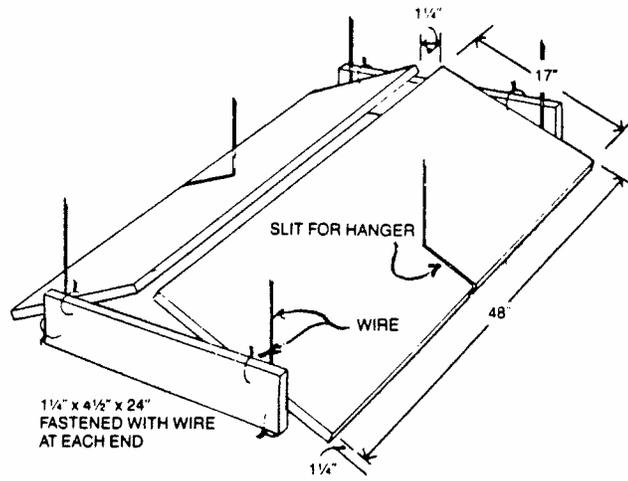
LIGHT FIXTURE PROTECTION
